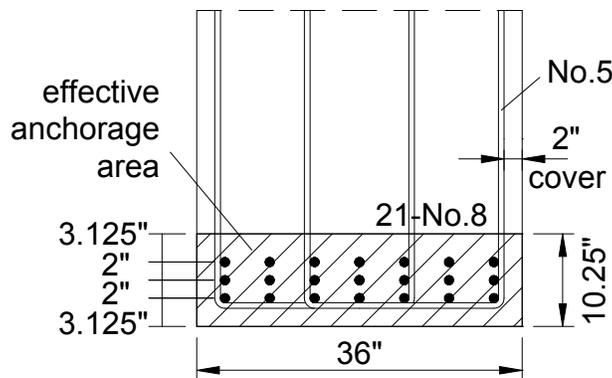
Effective anchorage area of tension tie reinforcement.
